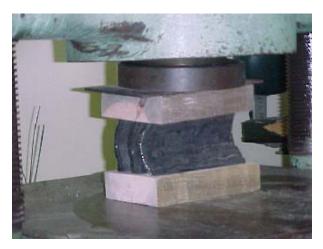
Compression Test on Rubber-Wood Offset Block Model
